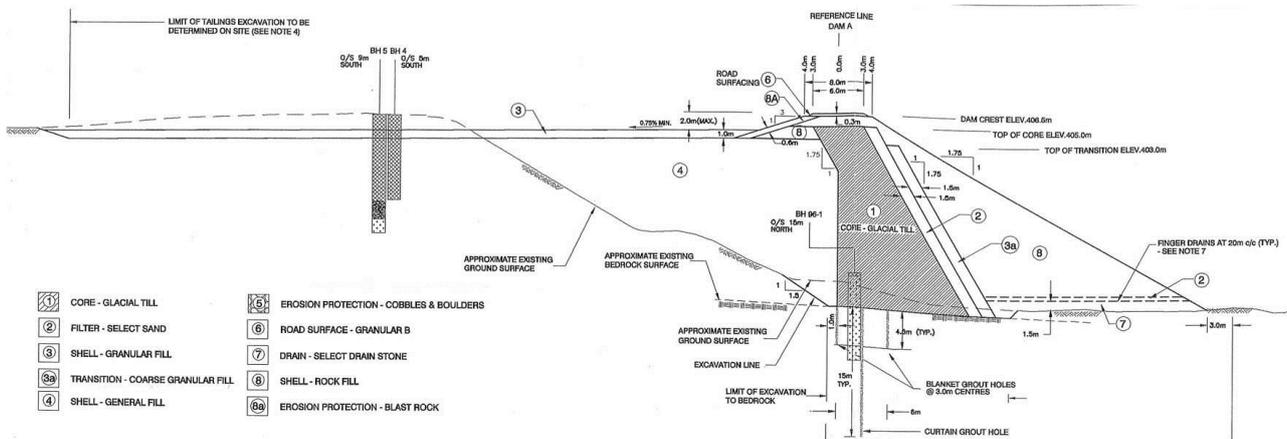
A typical dam replacement design to re-construct the tailings boundary
